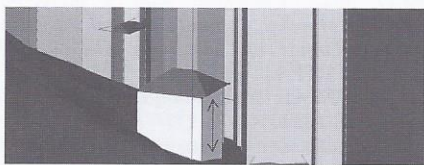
Adaptation of a building's raw block level to its roofing altimetric positioning.
